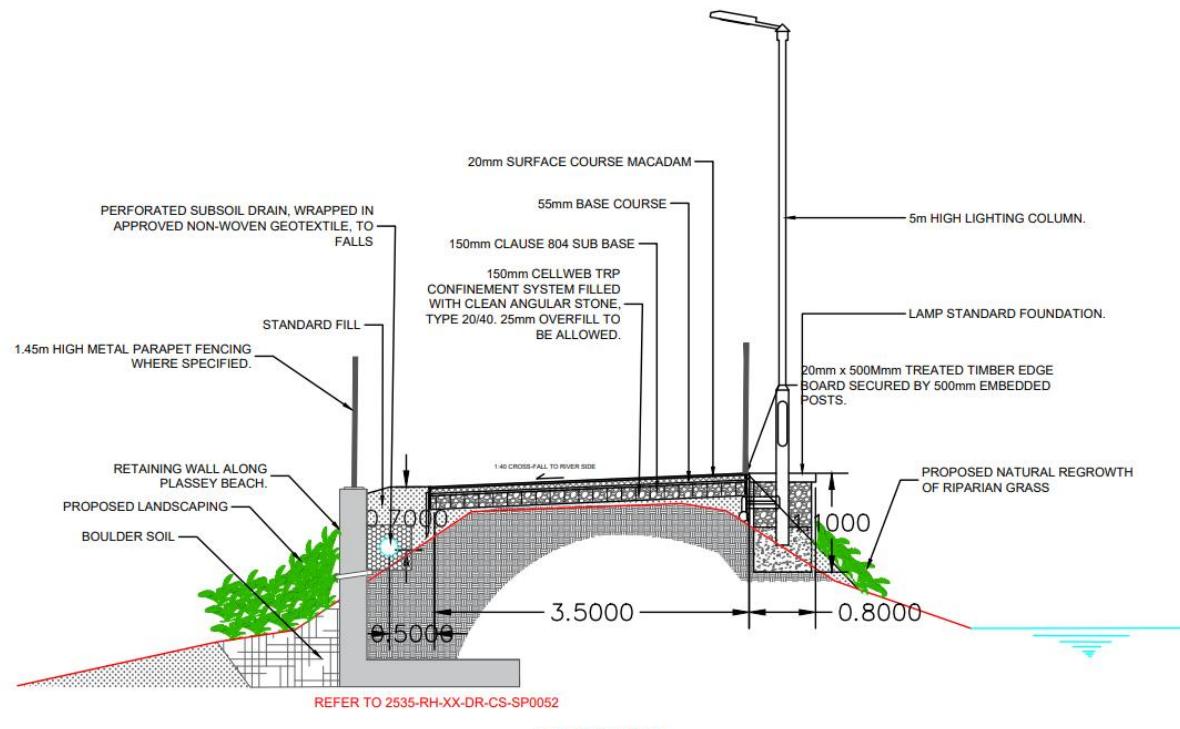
Proposed plan of ramp and Bridge 5 at Plassey Beach
